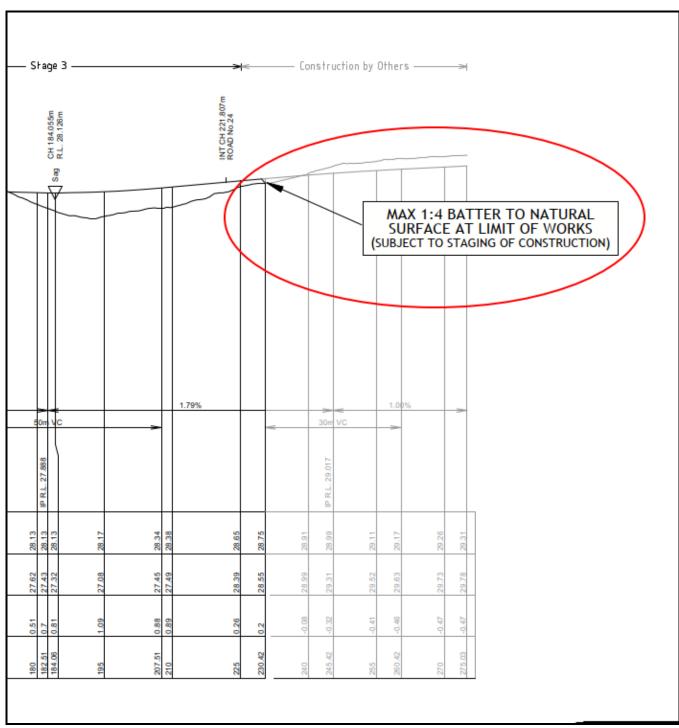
B – Road 02 long section – in conflict with Condition 47 at limit of works.
